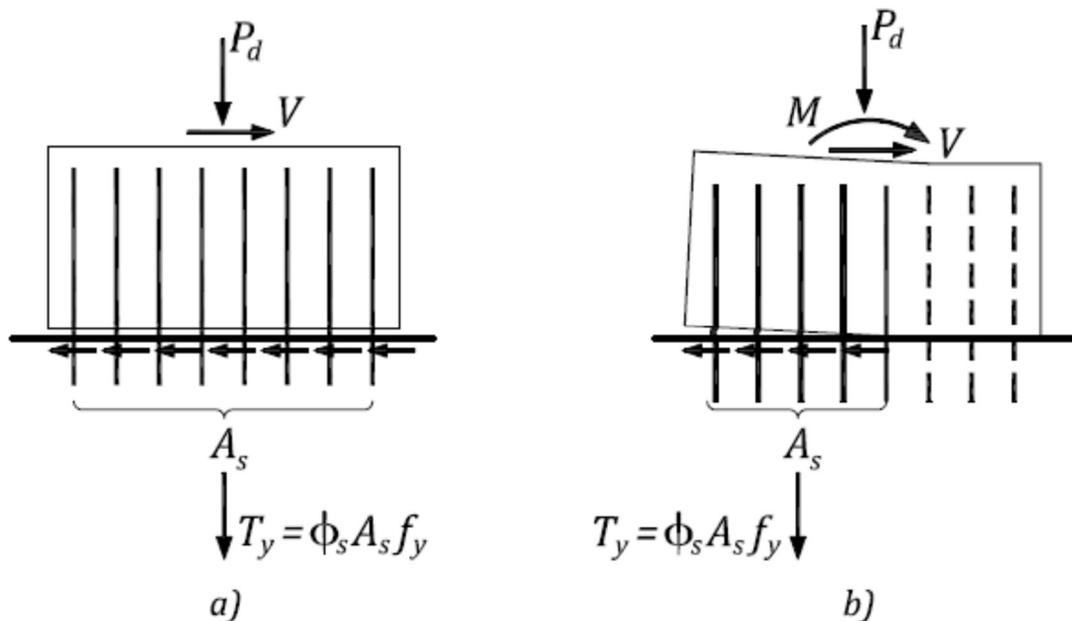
In-plane sliding shear resistance in masonry shear walls: a) Conventional Construction and Moderately Ductile shear walls, and b) Ductile shear walls.
